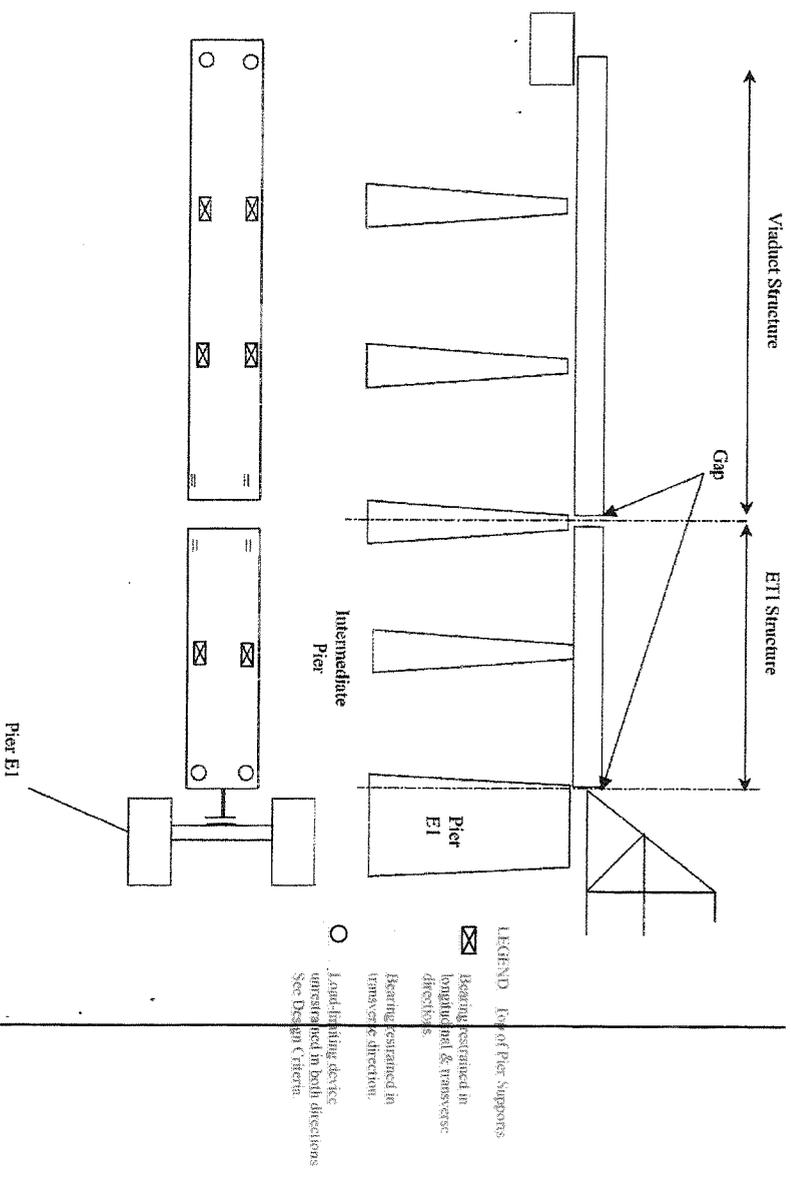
Schematics Elevation and plan-Articulation of Temporary Bypass Structure
